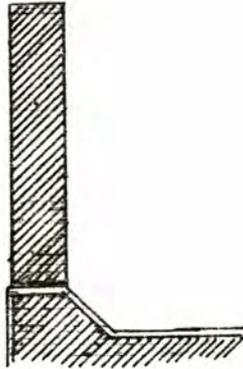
PERMISSIBLE METHOD OF TAKING CONDUCTOR THROUGH A PARAPET WALL
